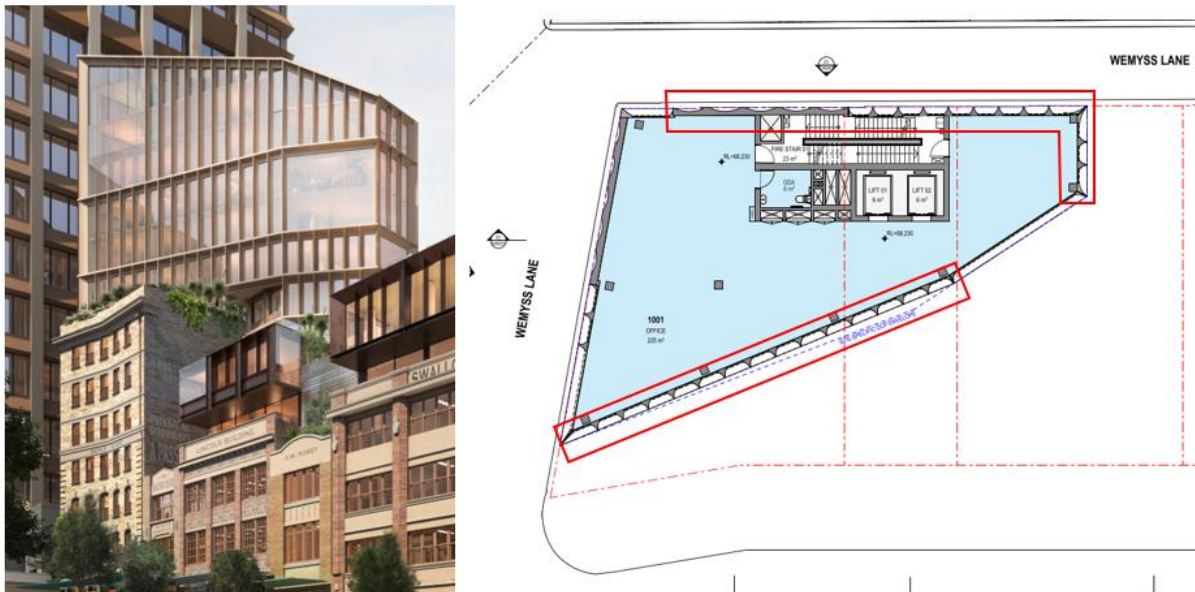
Proposed photomontage of the tower addition, depicting the large picture windows and vertical fins (left) and level 10 floor plan of the tower with fins outlined in red to be increased in depth to provide shading
